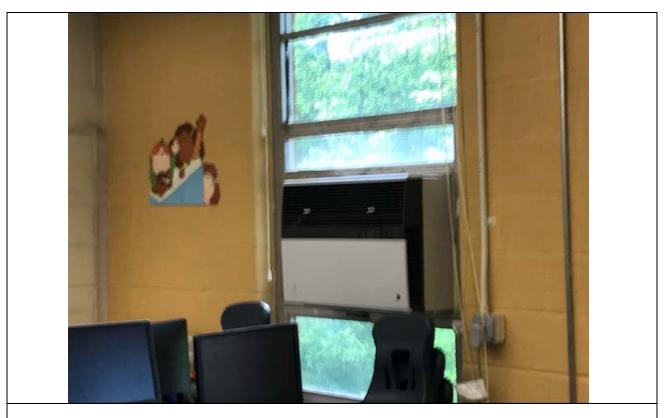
Library – Wall Mounted Air Conditioning Unit.
